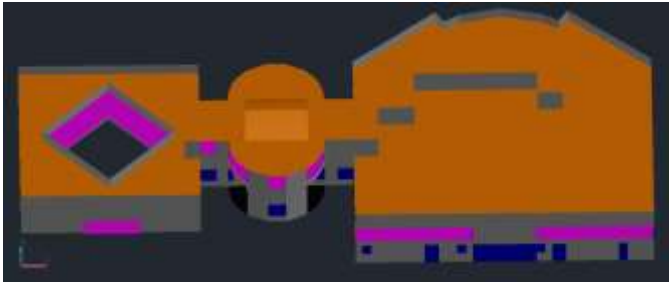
3D view of the University Canteen without horizontal external shading devices.
